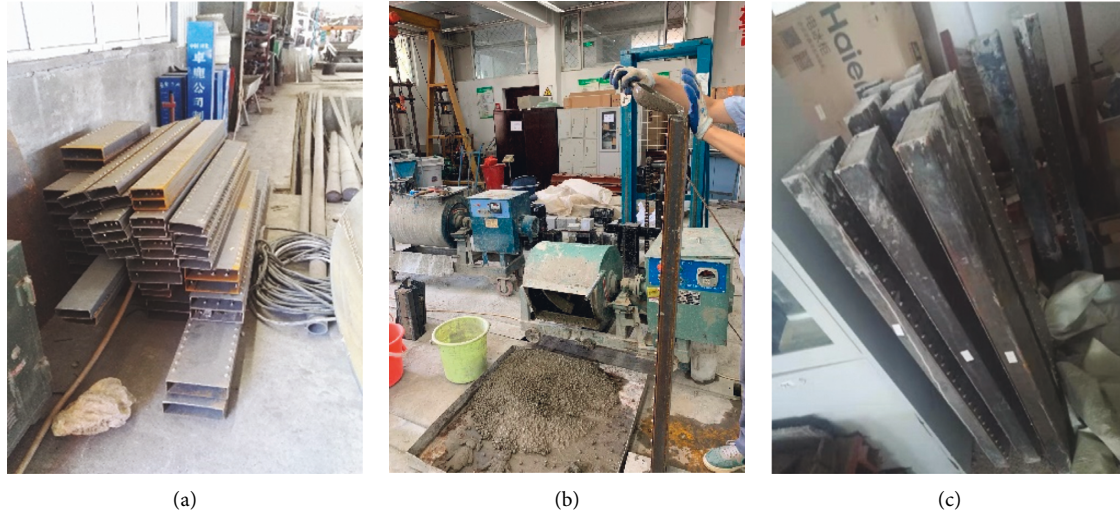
Manufacturing process of the specimen. (a) Hollow built-up column. (b) Concrete pouring process. (c) Processed specimens.
